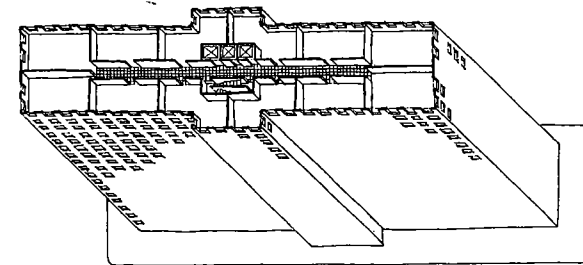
Double-Loaded Corridor Apartment Building. Exploded view of a typical floor of a high-rise double-loaded corridor building. Note position of elevator and scissors stairwell.
